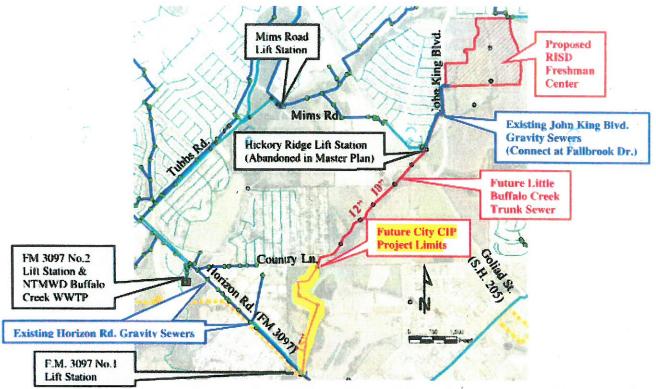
Future Little Buffalo Creek Trunk Sewer
